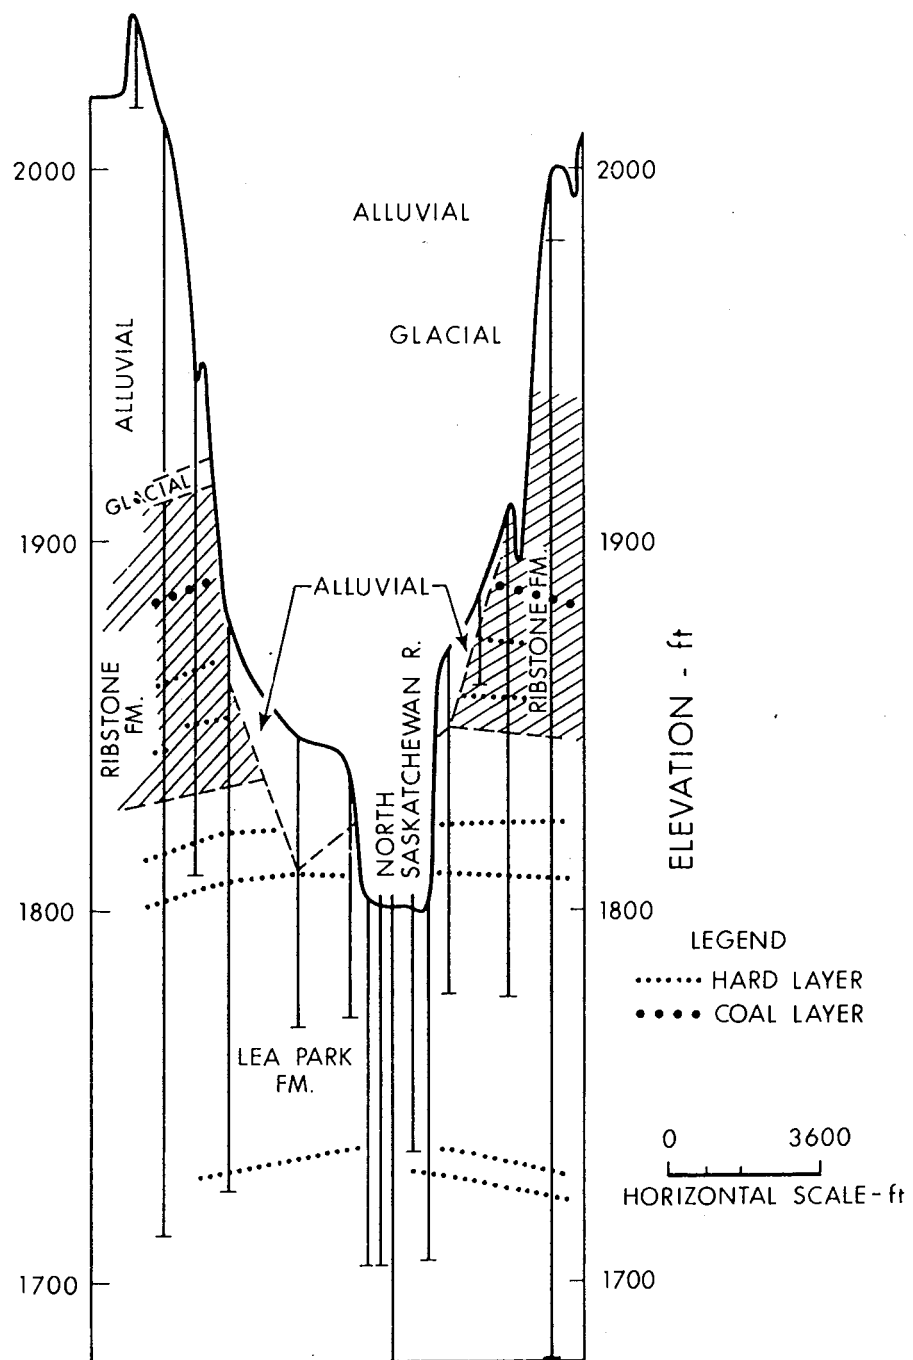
Marker bed profiles at Hairy Hill Dam site (from P.F.R.A. plan 31059).
